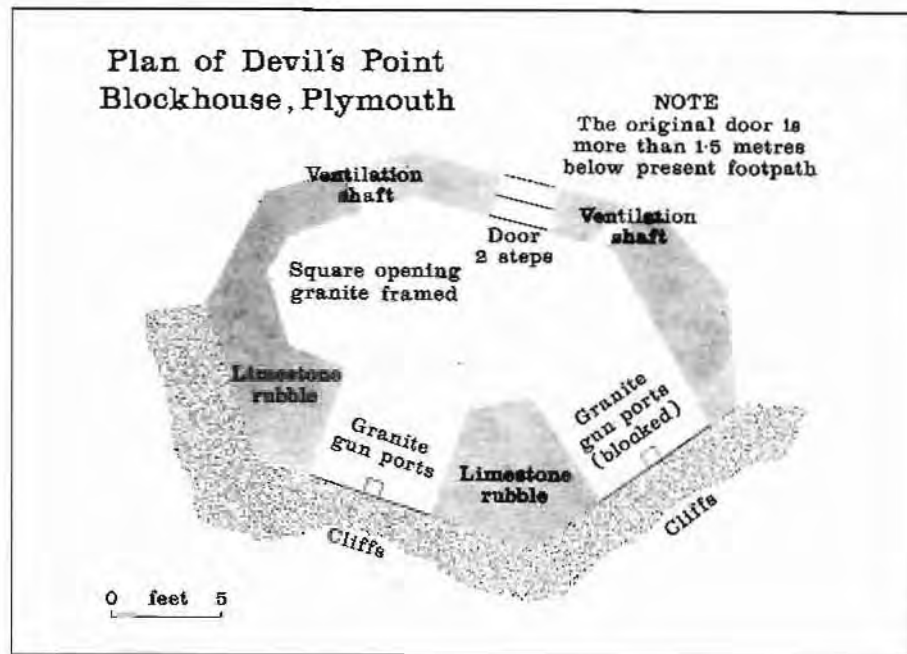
Plan of the surviving blockhouse at Devil's Point.
